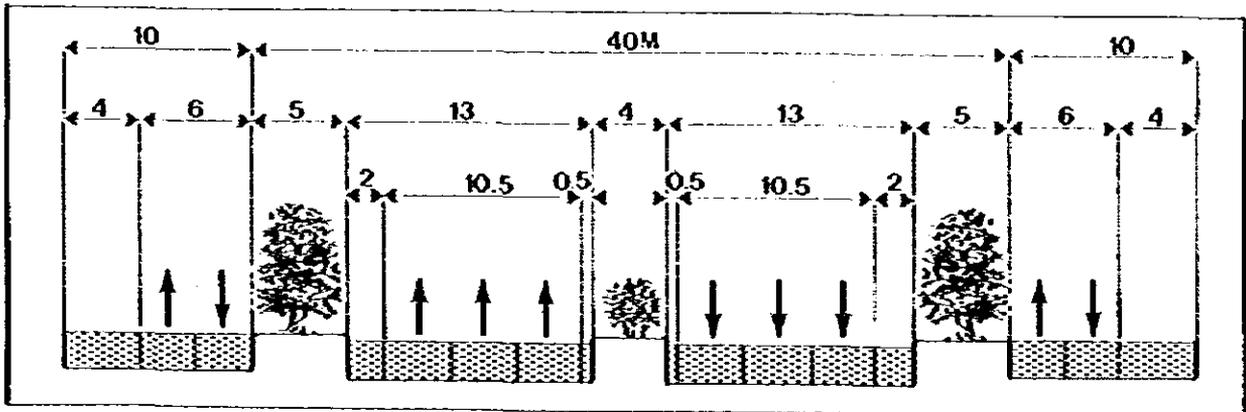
TYPICAL CROSS-SECTION OF JLN TABRAU (6-LANE)
